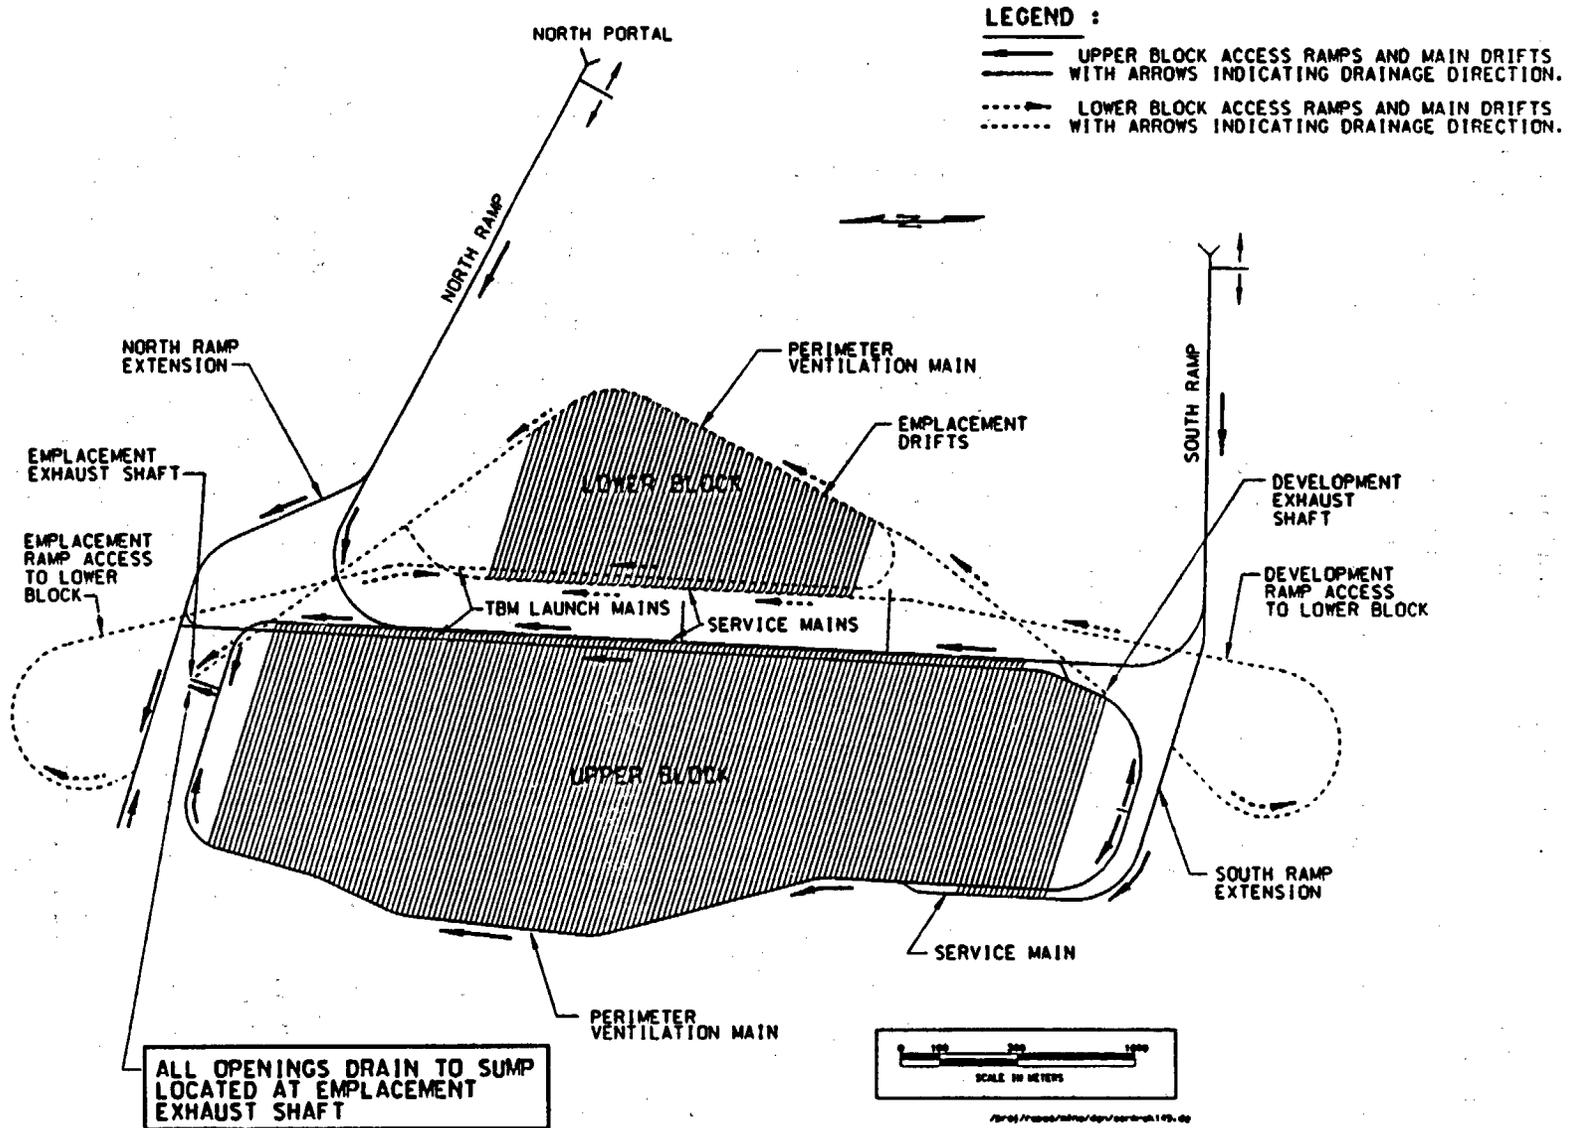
Subsurface Drainage Pattern-Interim Layout
